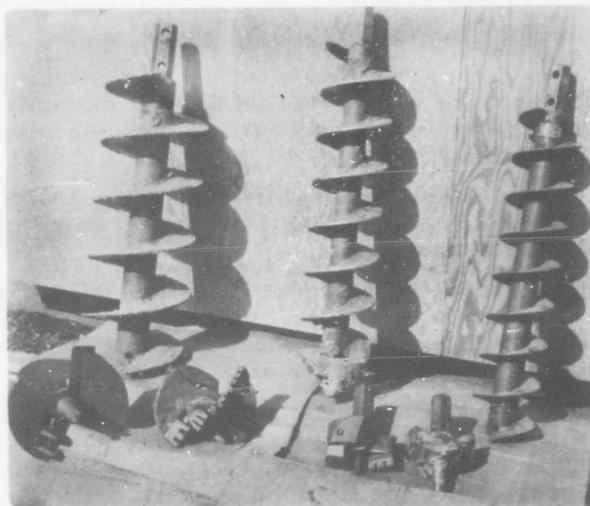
Ka-Mo augers and cutting heads. The long center-screw heads, shown at extreme right and left of photo, did not penetrate the soil as well as the pilot-screw heads, shown in center.
